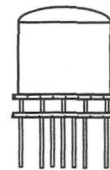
The design elevation diagram of the tank, deck, pile cap, and piling.
